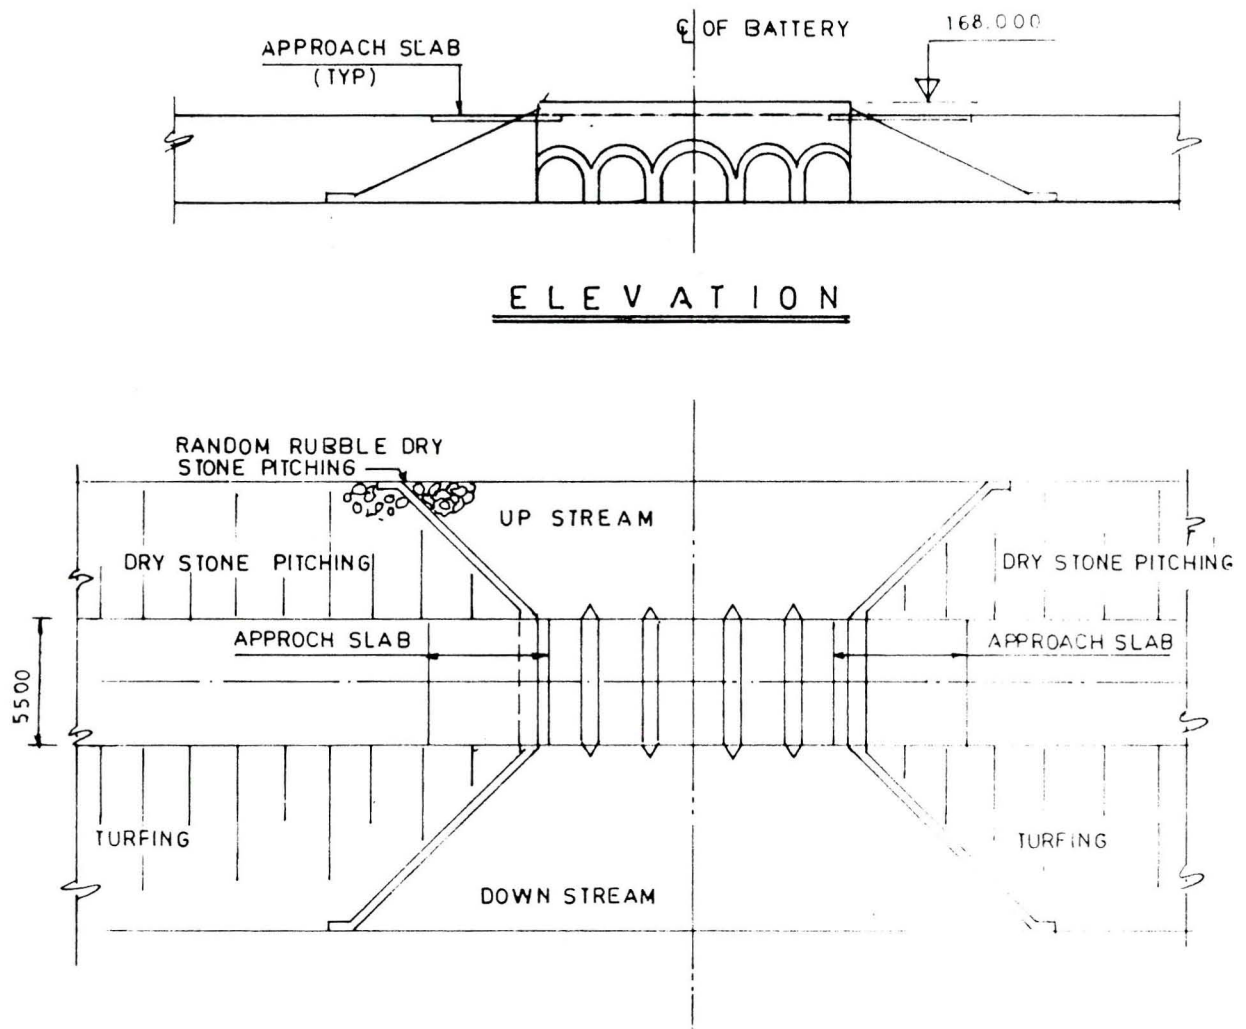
TYPICAL PLAN OF ONE BATTERY OF BRICK ARCH CULVERT
